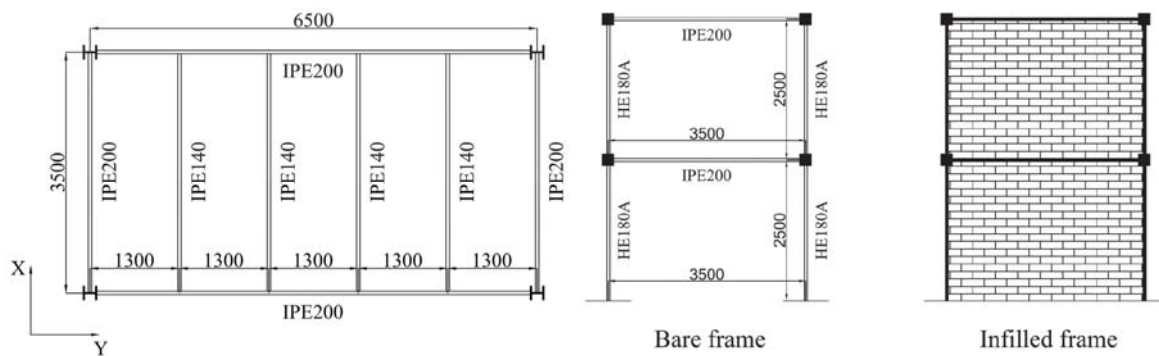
Plan and side view of the steel frame experimentally tested in the laboratory.
